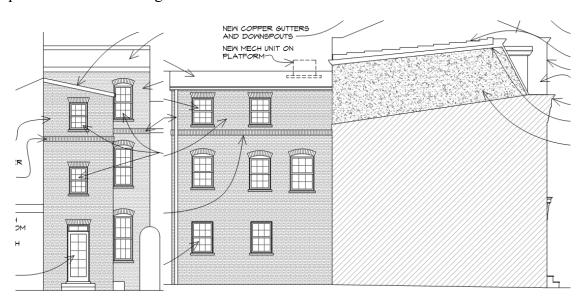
North and west elevations showing materials at third floor addition on front portion of building
